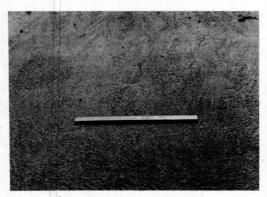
Transverse crack on main lane, 8-in. pavement (Tarrant County Project).
